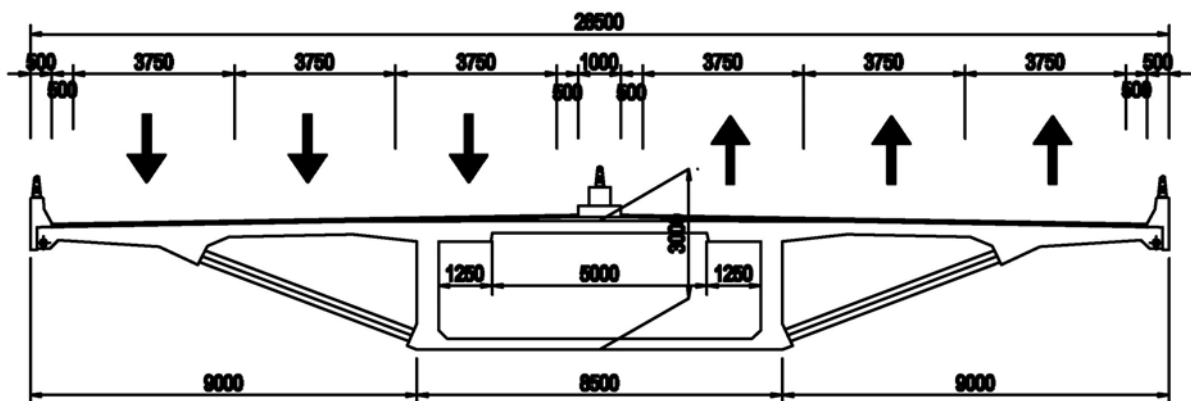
Typical Cross Sections of Alternative (4), Case 6-3.75
